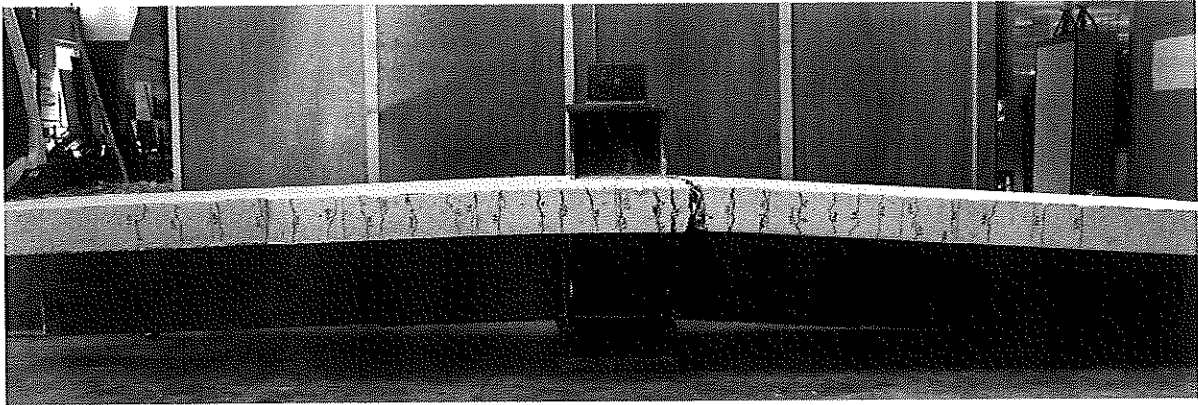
Side elevation of failed test specimen (Test A-5)
